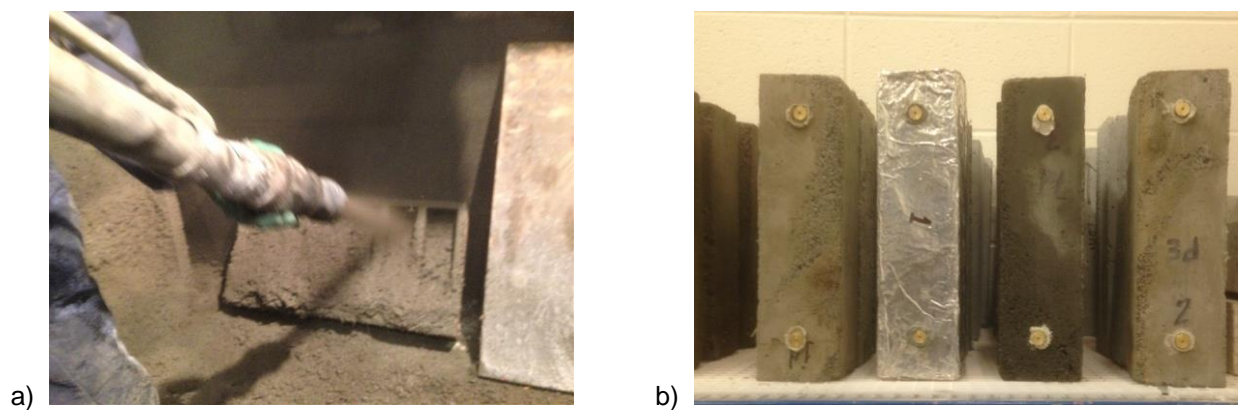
Shrinkage test specimens: a) spraying process; b) testing layout
